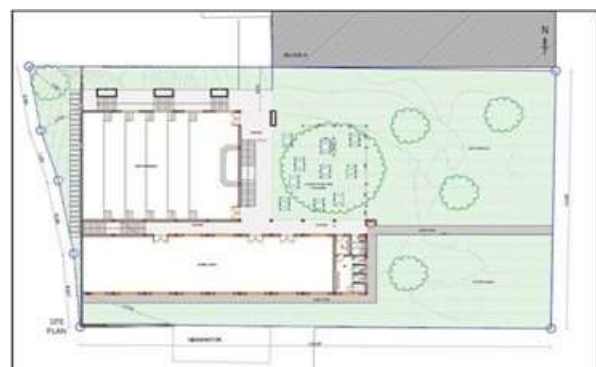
Layout Plan of the Textile Studio, Lecture Rooms and Lecture Theatre Building Site.
